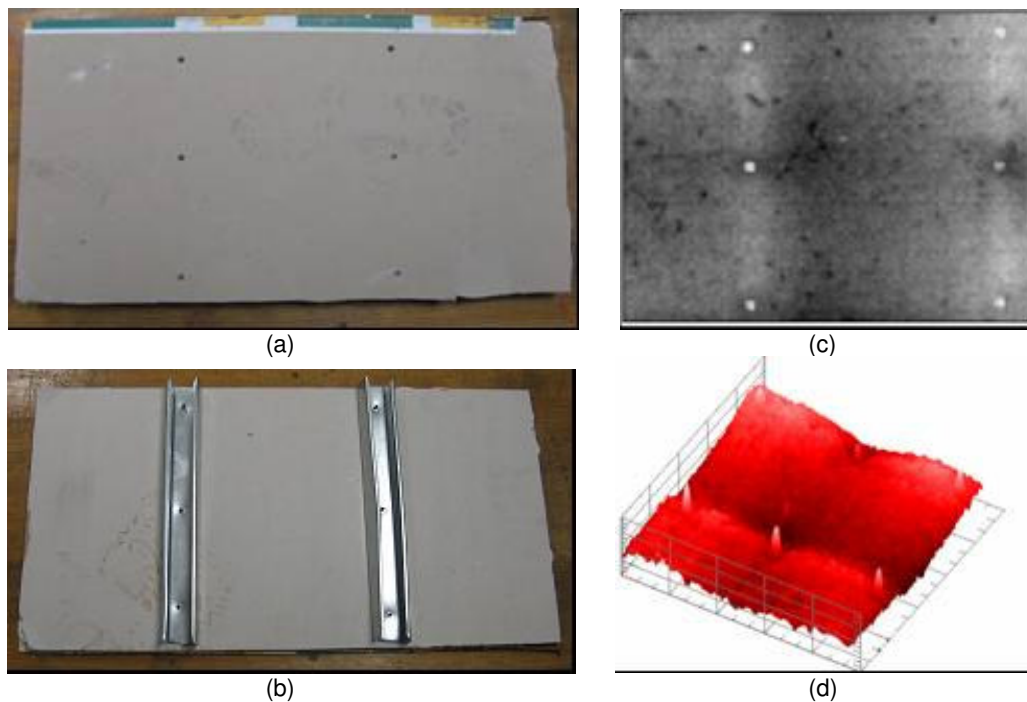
View of the sample D: (a) front face; (b) rear face; (c) photothermal image obtained; (d) 3D view
